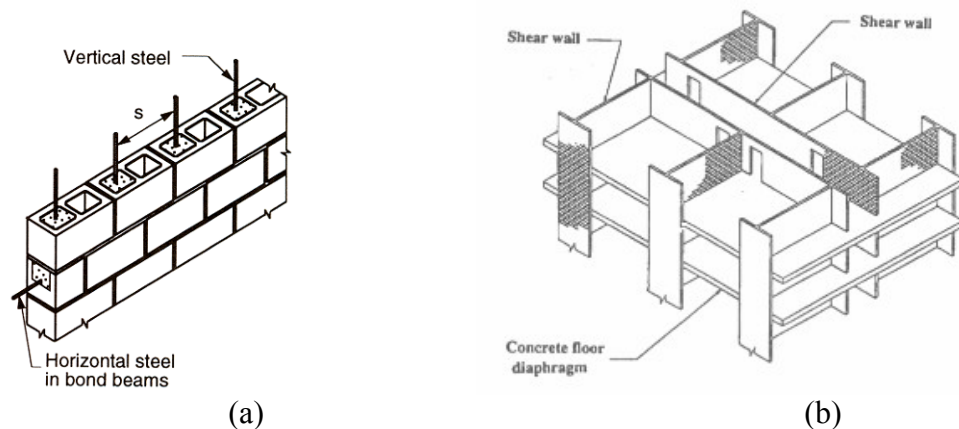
(a) Partially-Grouted Reinforced Masonry, (b) A Typical Multi-story Building with Reinforced Masonry Shear Walls as Lateral Force Resisting System [1]
